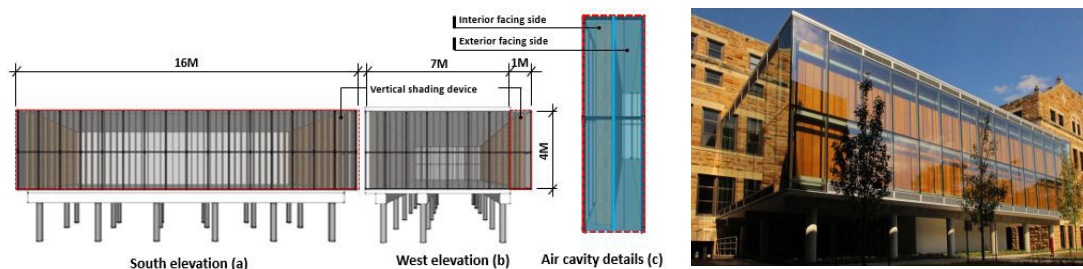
(1a)South elevation; (1b) west elevation (1c) section details and perspective.
